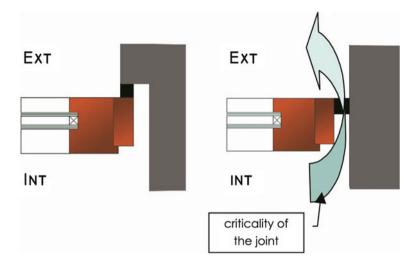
Example of a wall curb sill extruded over the jamb of the window frame (*left*) and window frame flashed along the exterior wall casing
